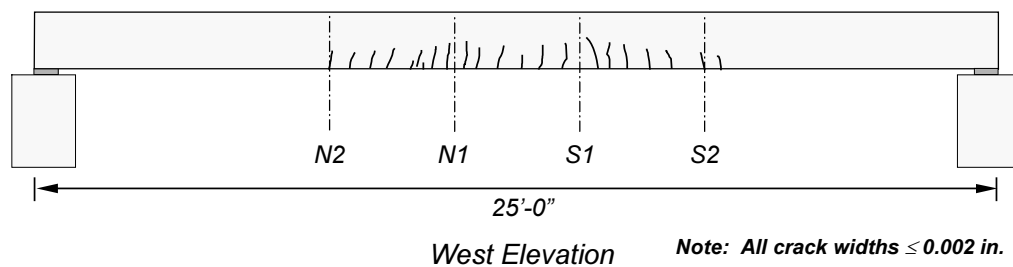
Typical Crack Pattern after Load Cycles to 7 kip on Specimen FS-1 before CFRP Strengthening
